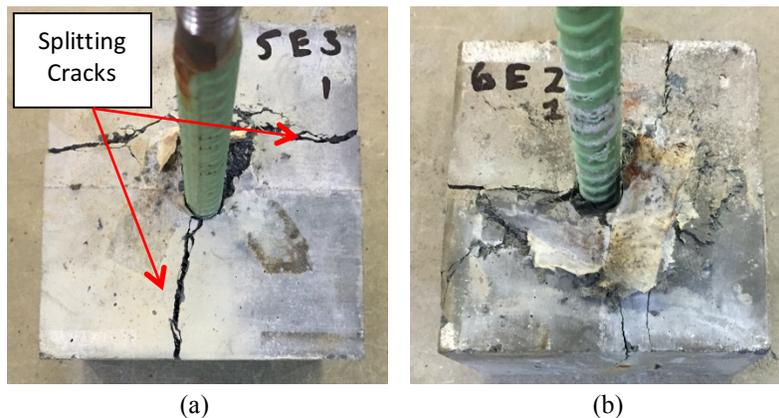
(a) Bar Slip, and (b) Conical Concrete Failure
